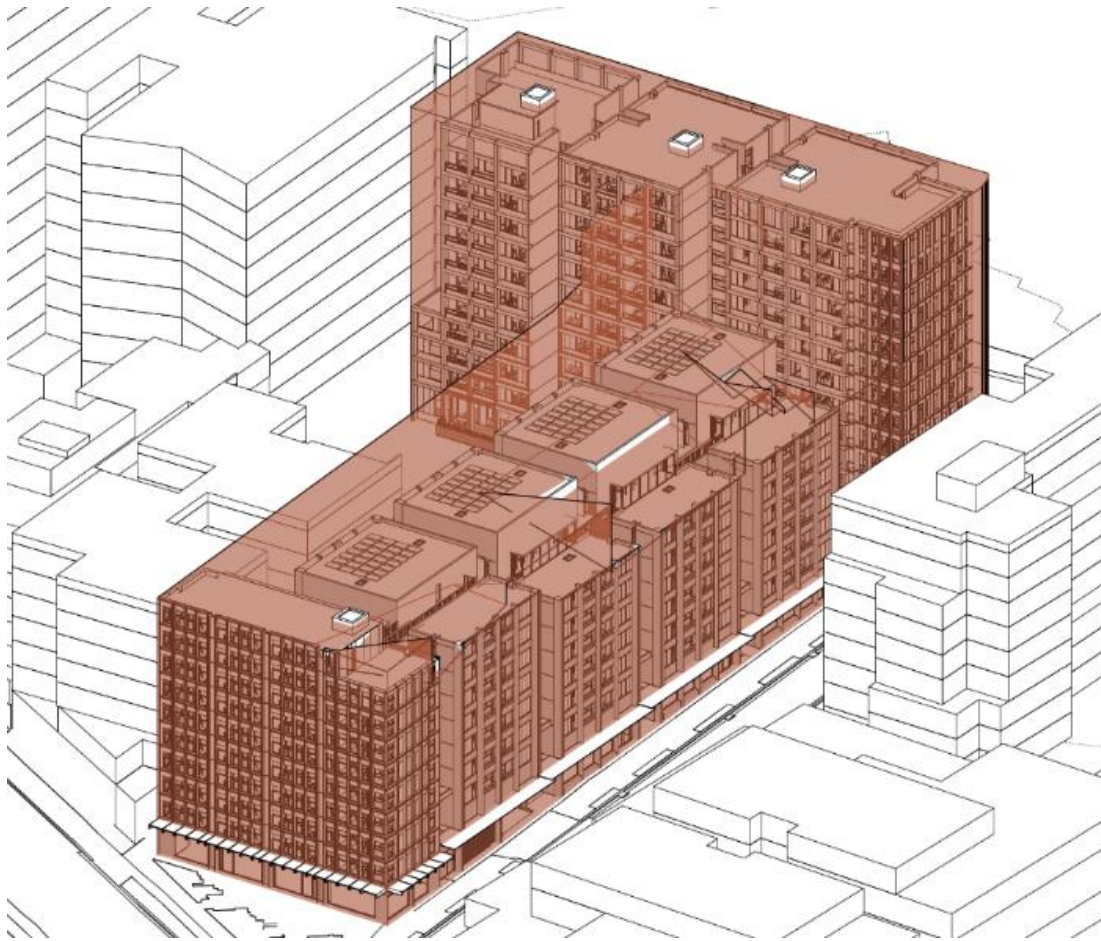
Proposed encroachments outside of the building envelope approved by D/2021/1484
